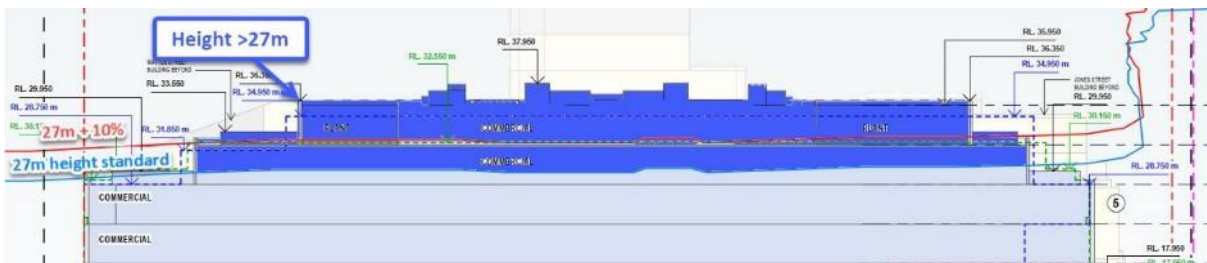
Building E - Fig Street Section Detail: Height >27m (Sydney LEP 2012, cl. 4.3)
